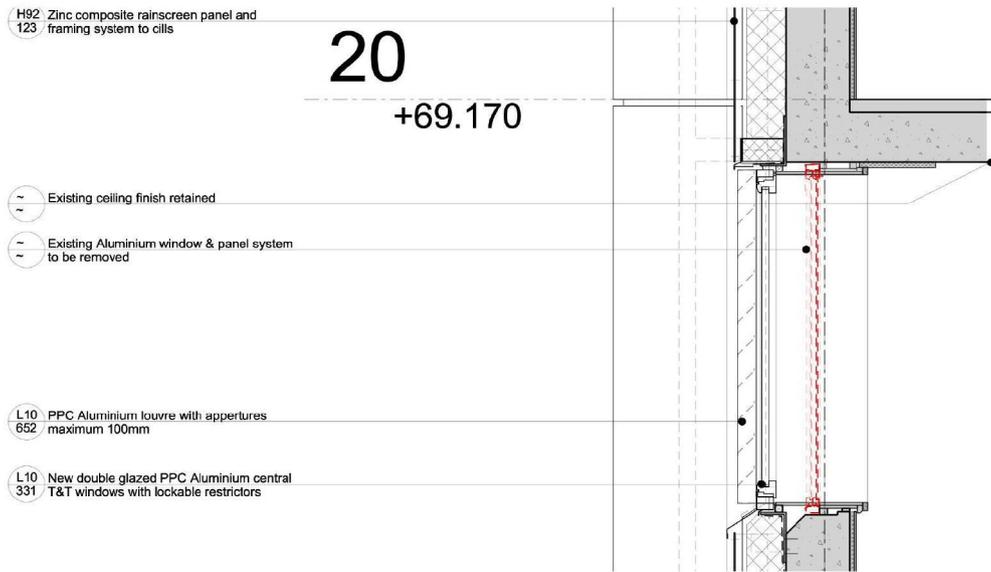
Extract from drawing 1279 (06) 120 'Detail Section Sheet 1' {SEA00003436}
